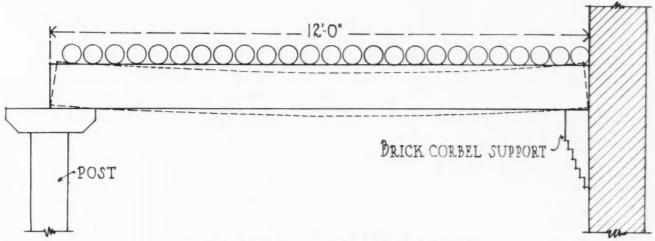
B. Floor Girder with Uniformly Distributed Load.
